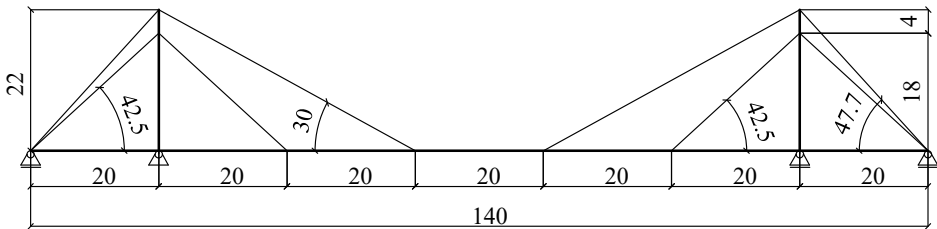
Typical cable-stayed bridge[m] (made by the author)
